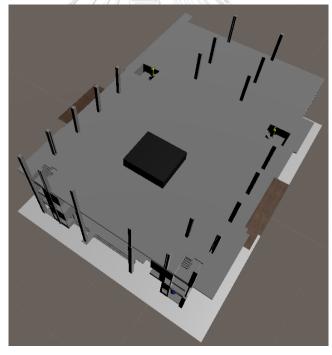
Fire extinguisher installation plan for 3rd floor of scenario 1D
